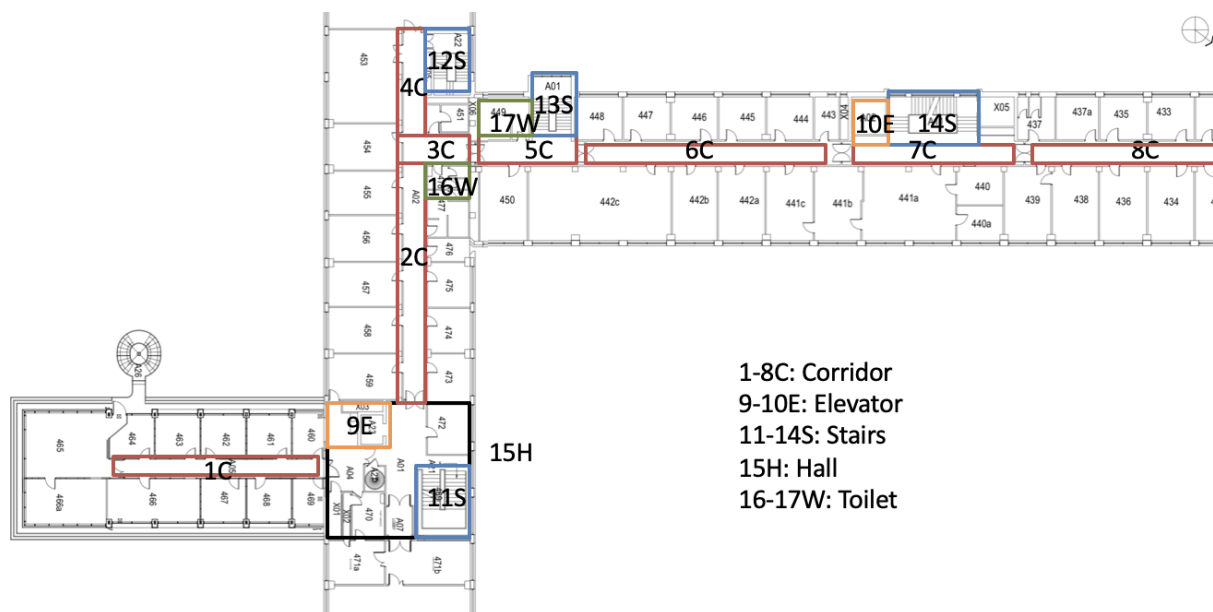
Floor plan of the fourth floor of the Mechanical Engineering building at University of Leeds and selected structural elements
